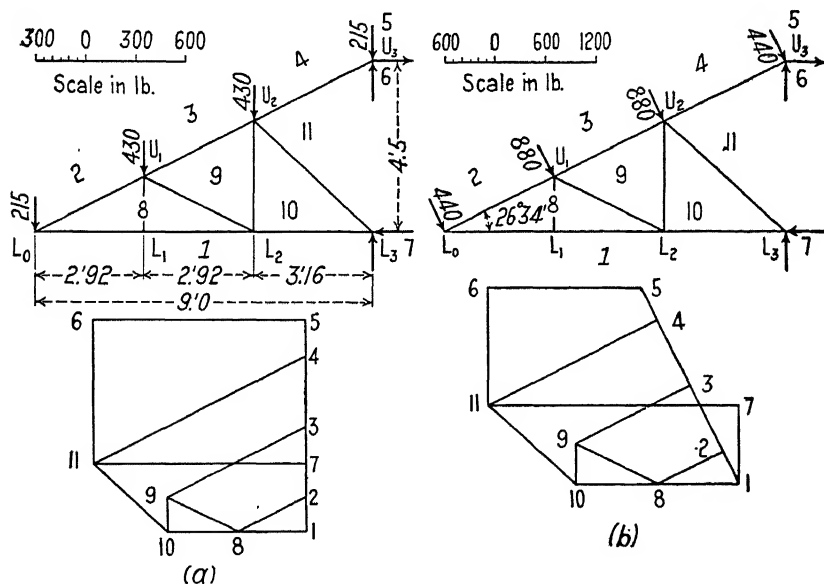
Stress Sheet for Cantilever Shelter Truss.
